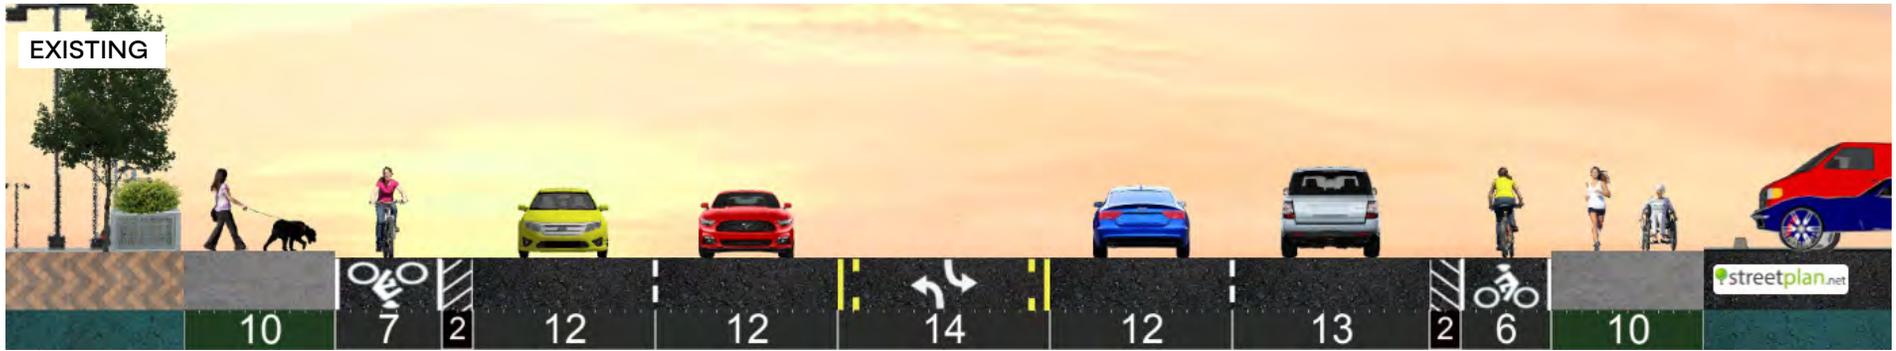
Existing Conditions: LOVR between 10<sup>th</sup> Street and Sunset Drive
